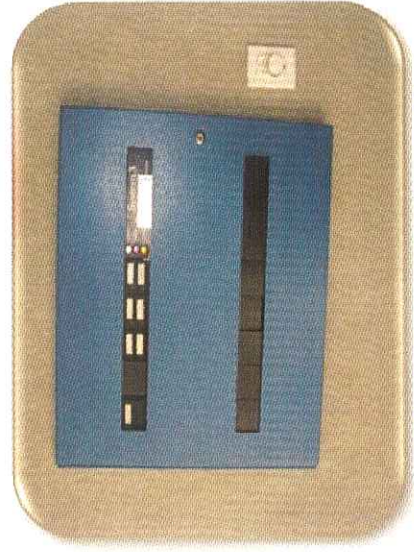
6-Zone Fire Alarm Panel Located in the Main Lobby of building.
